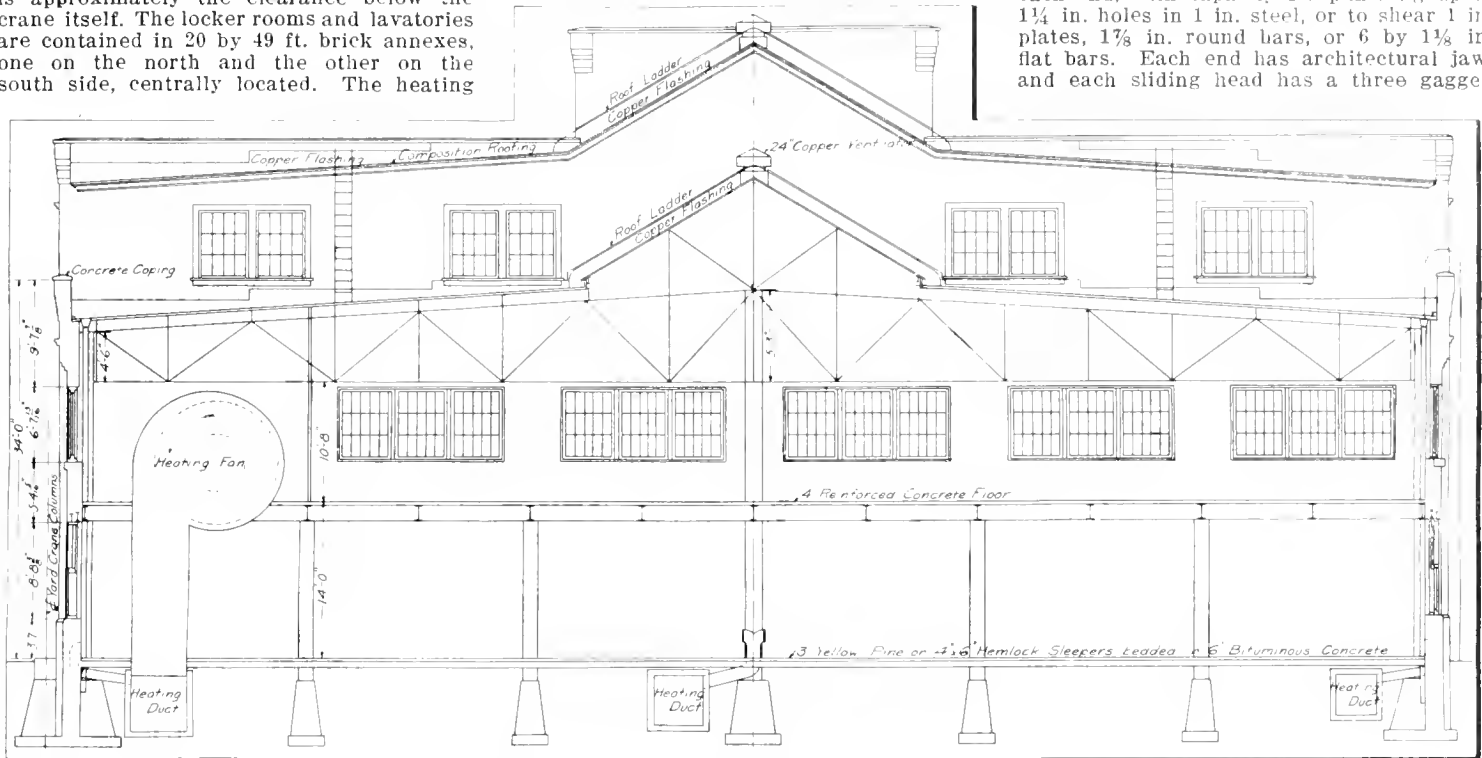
Cross Section of One of the Passenger Car Buildings, looking towards High End.
